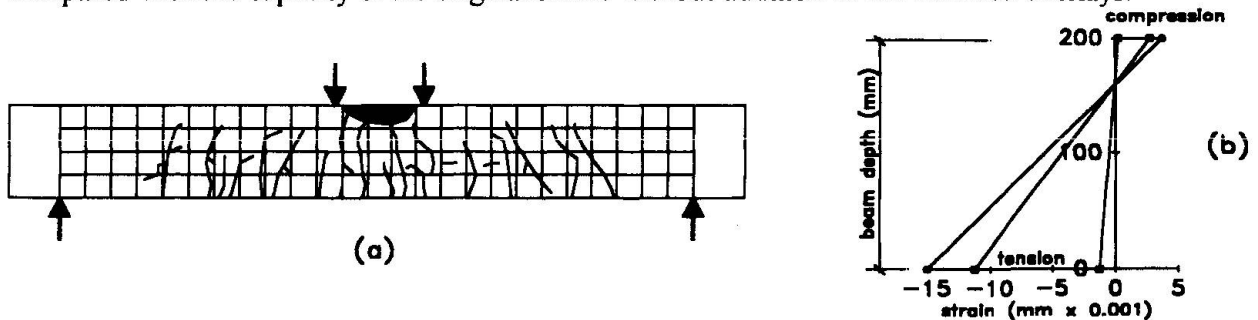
Behavior of beam Type S3. a- Crack pattern. b- Strain diagram.
